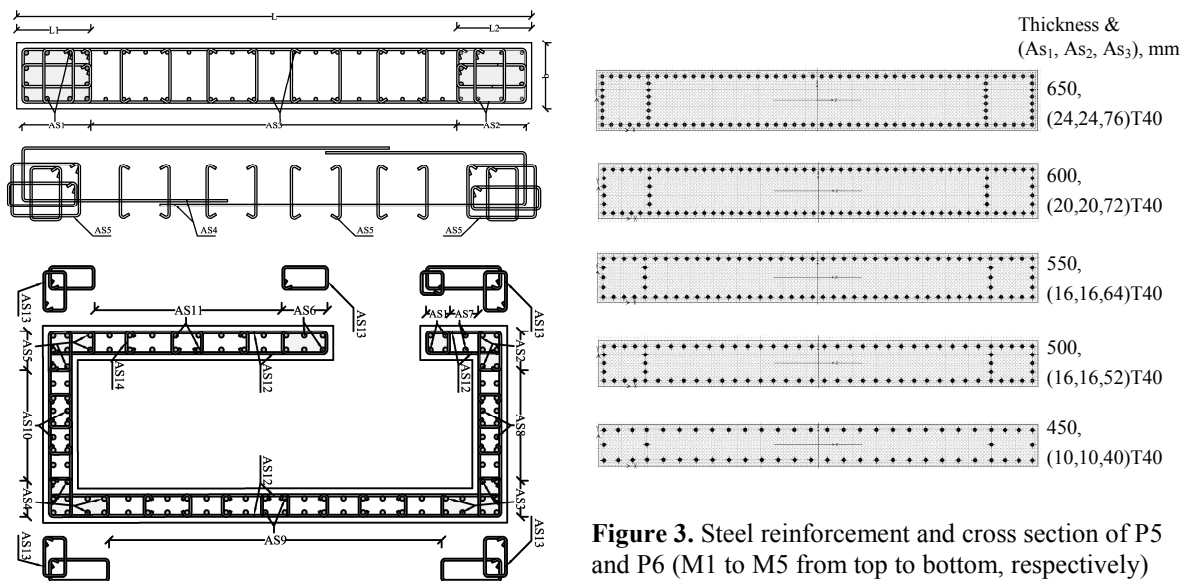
Steel reinforcement and cross section of P5 and P6 (M1 to M5 from top to bottom, respectively)
